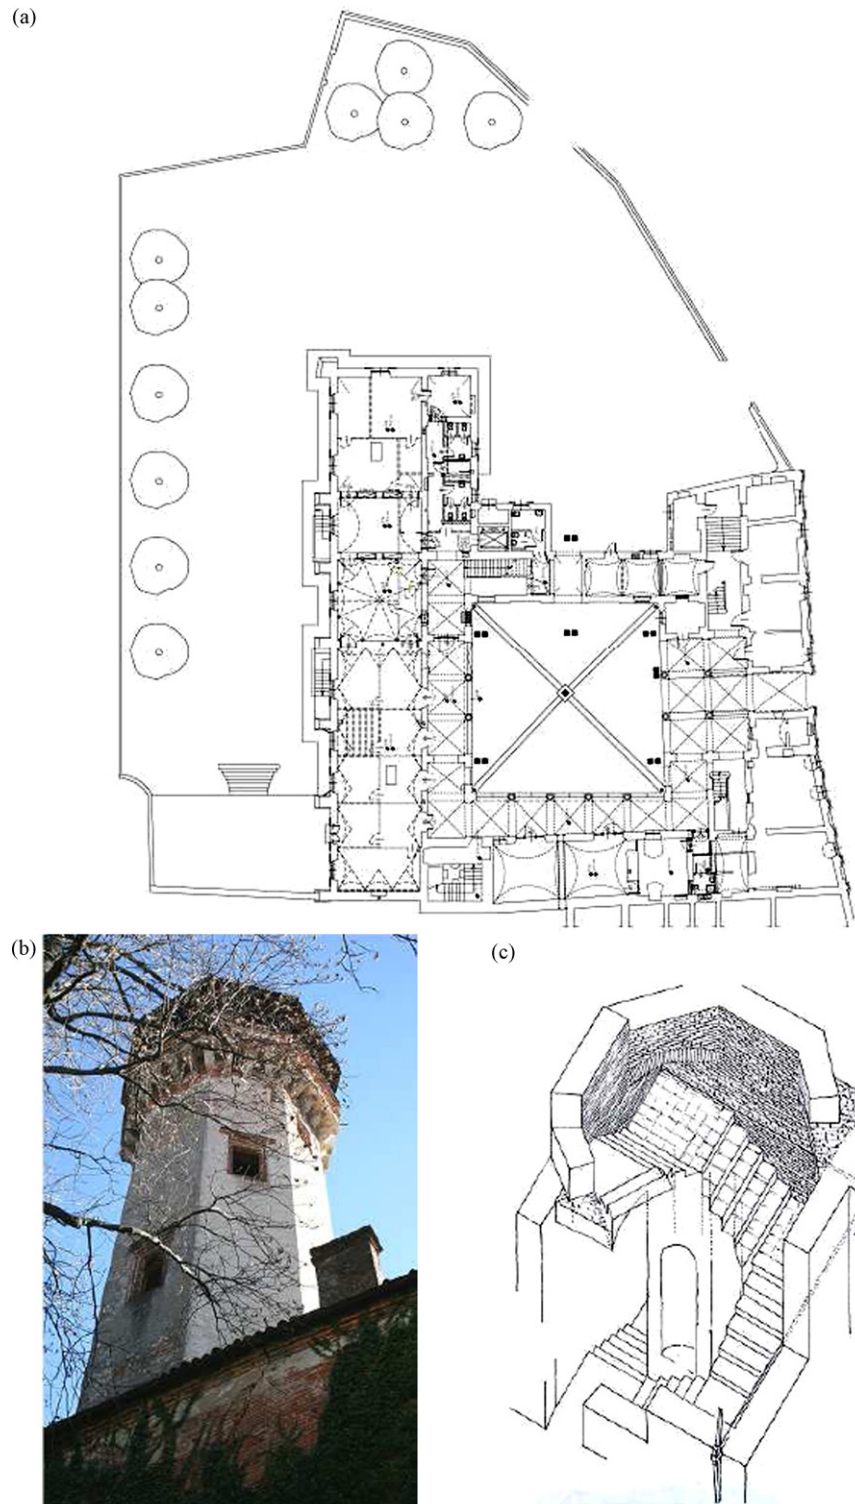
(a) Plane of Palace Masserano with the Tower; (b) Photographical view; (c) Sketch of the inner part of the tower with the central pillar.
